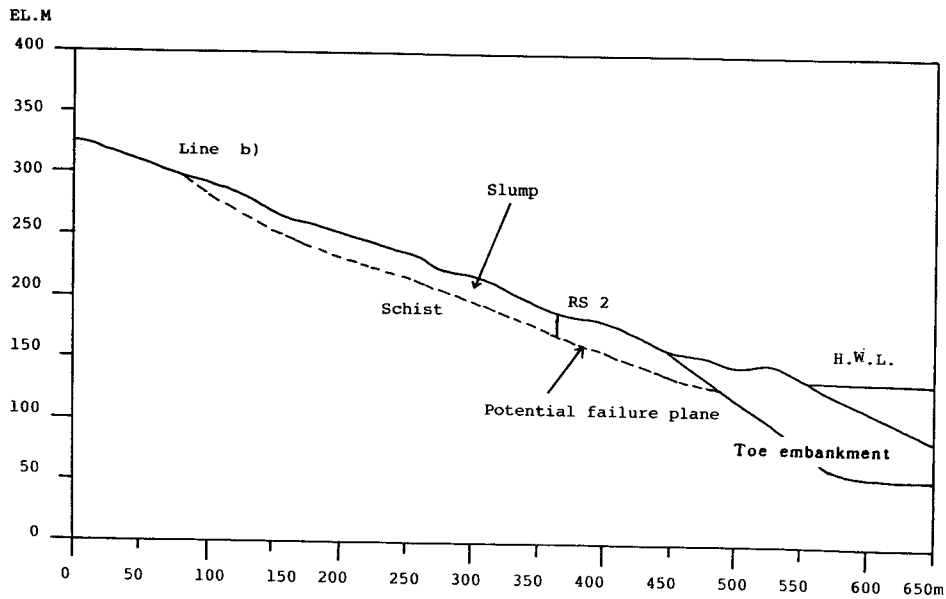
Profile of slump area after toe embankment location of line b) is shown in Fig. 3.
